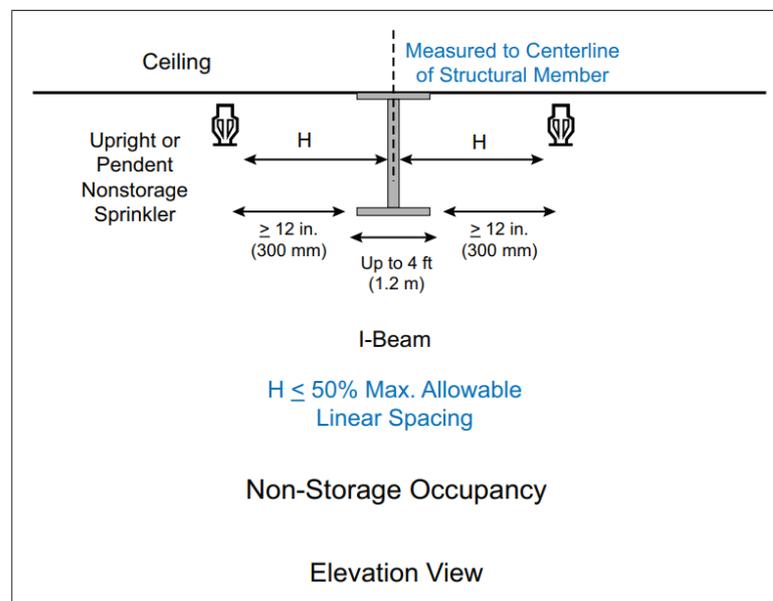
(b). Positioning ceiling-level sprinklers when ceiling structural members obstruct sprinkler discharge
